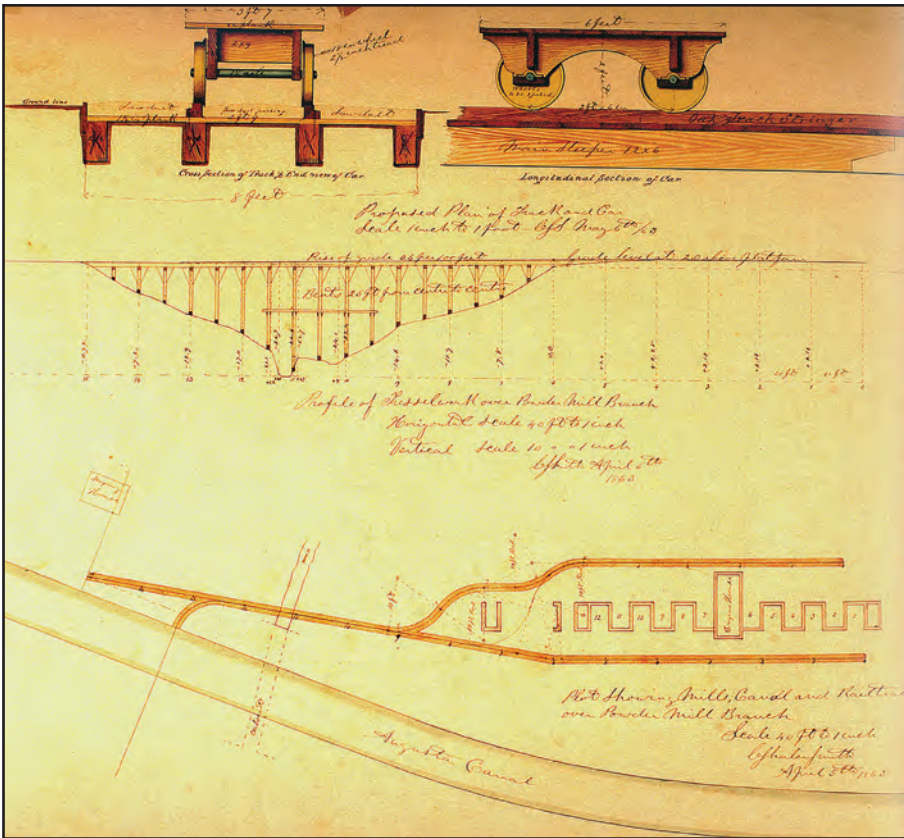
Plan of the rail system linking the incorporating mills, mixing house and cooling magazines. (Blanchard Family Collection)
